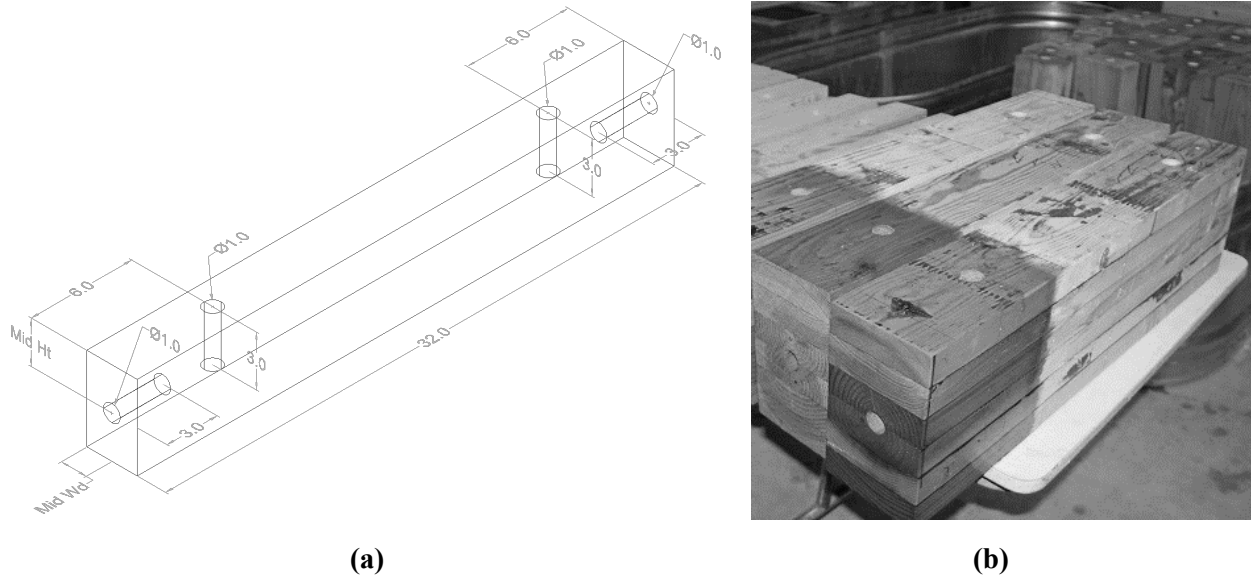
Fungal cavity holes in specimens: (a) locations of drilled holes. Units shown are in inches (1 in. = 25.4 mm); (b) holes drilled in a six-layer glulam.
